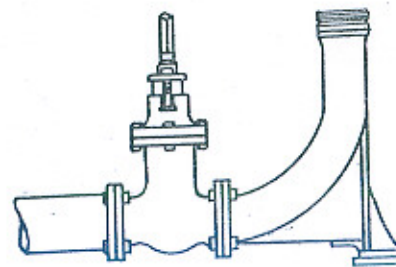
L.C.G. SINGLE PATTERN SLUICE VALVE HYDRANT.
